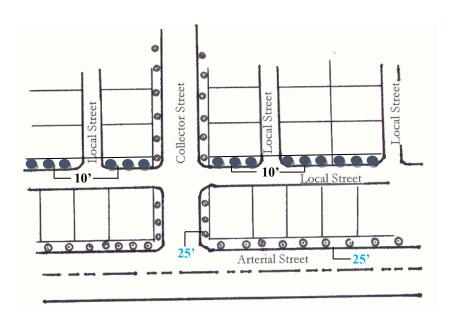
5 – Access Requirements for Arterial and Collector Roads
